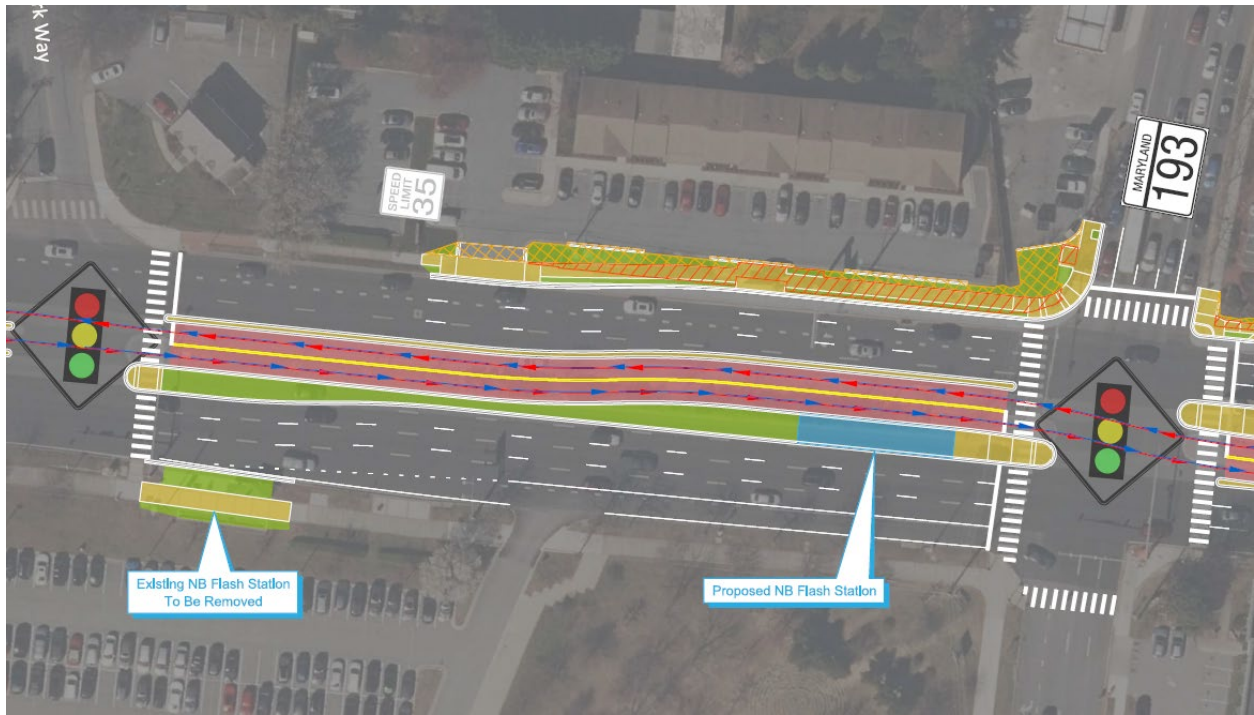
Existing and Proposed Northbound Flash Station (Four Corners)
